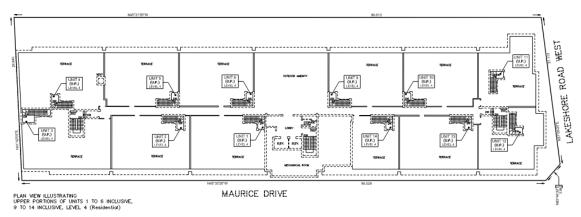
Draft Plan of Condominium Floor 4 and Rooftop Terrace
